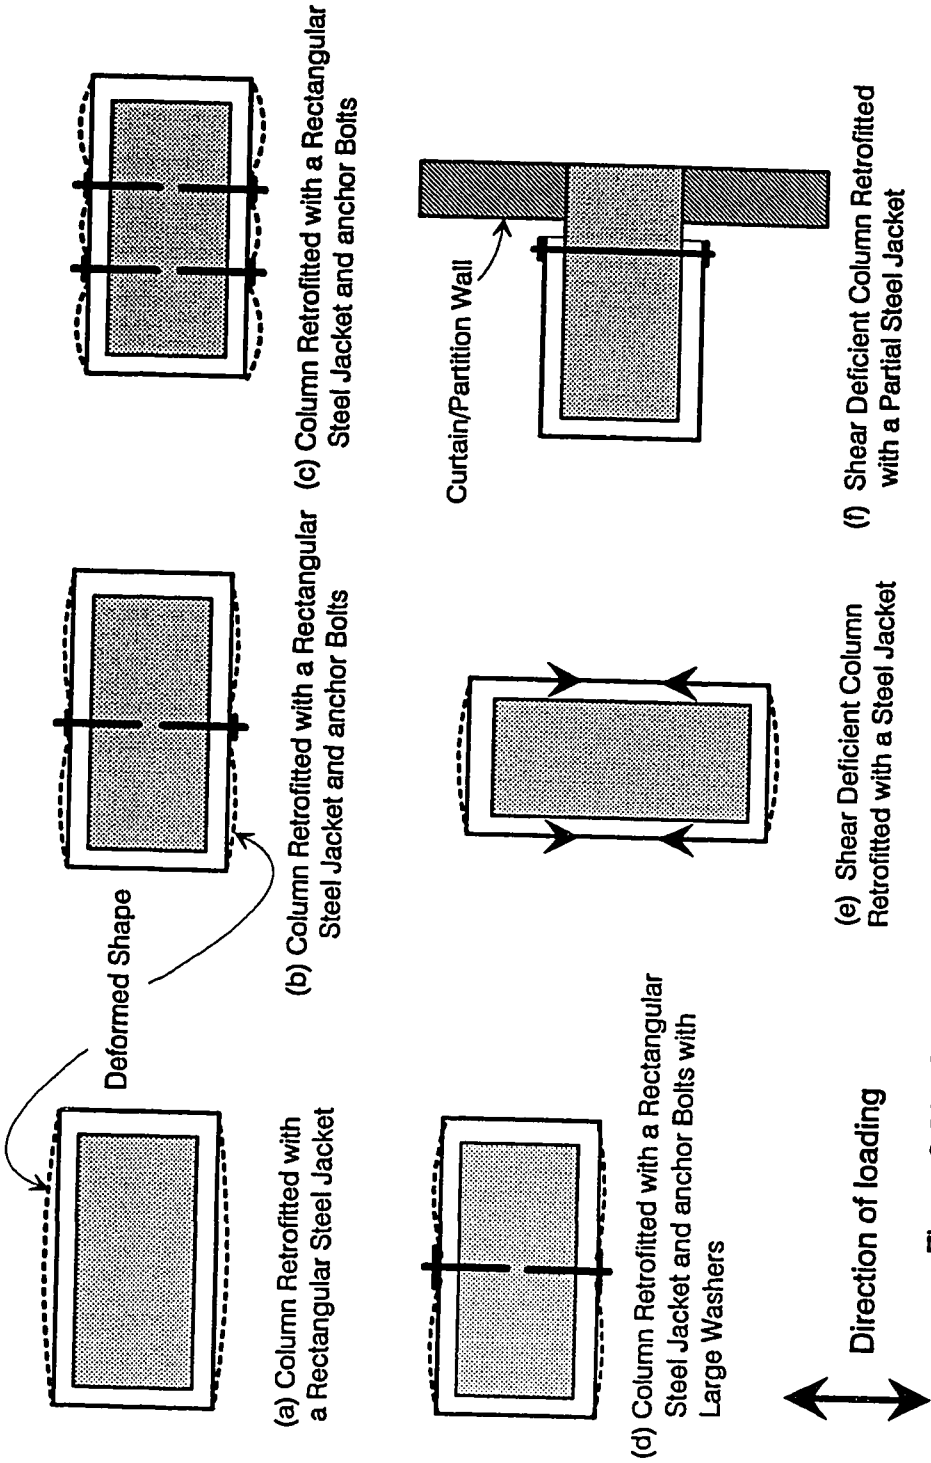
Column Strengthening by the use of Rectangular steel jackets
